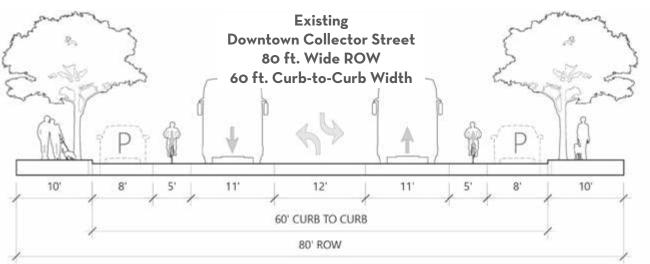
Existing: Typical Downtown Collector Street with a 80 ft. wide ROW and 60 ft. wide curb-to-curb. See Chapter 8D-1 Roadway Reconfigurations for minimum travel lane widths.
